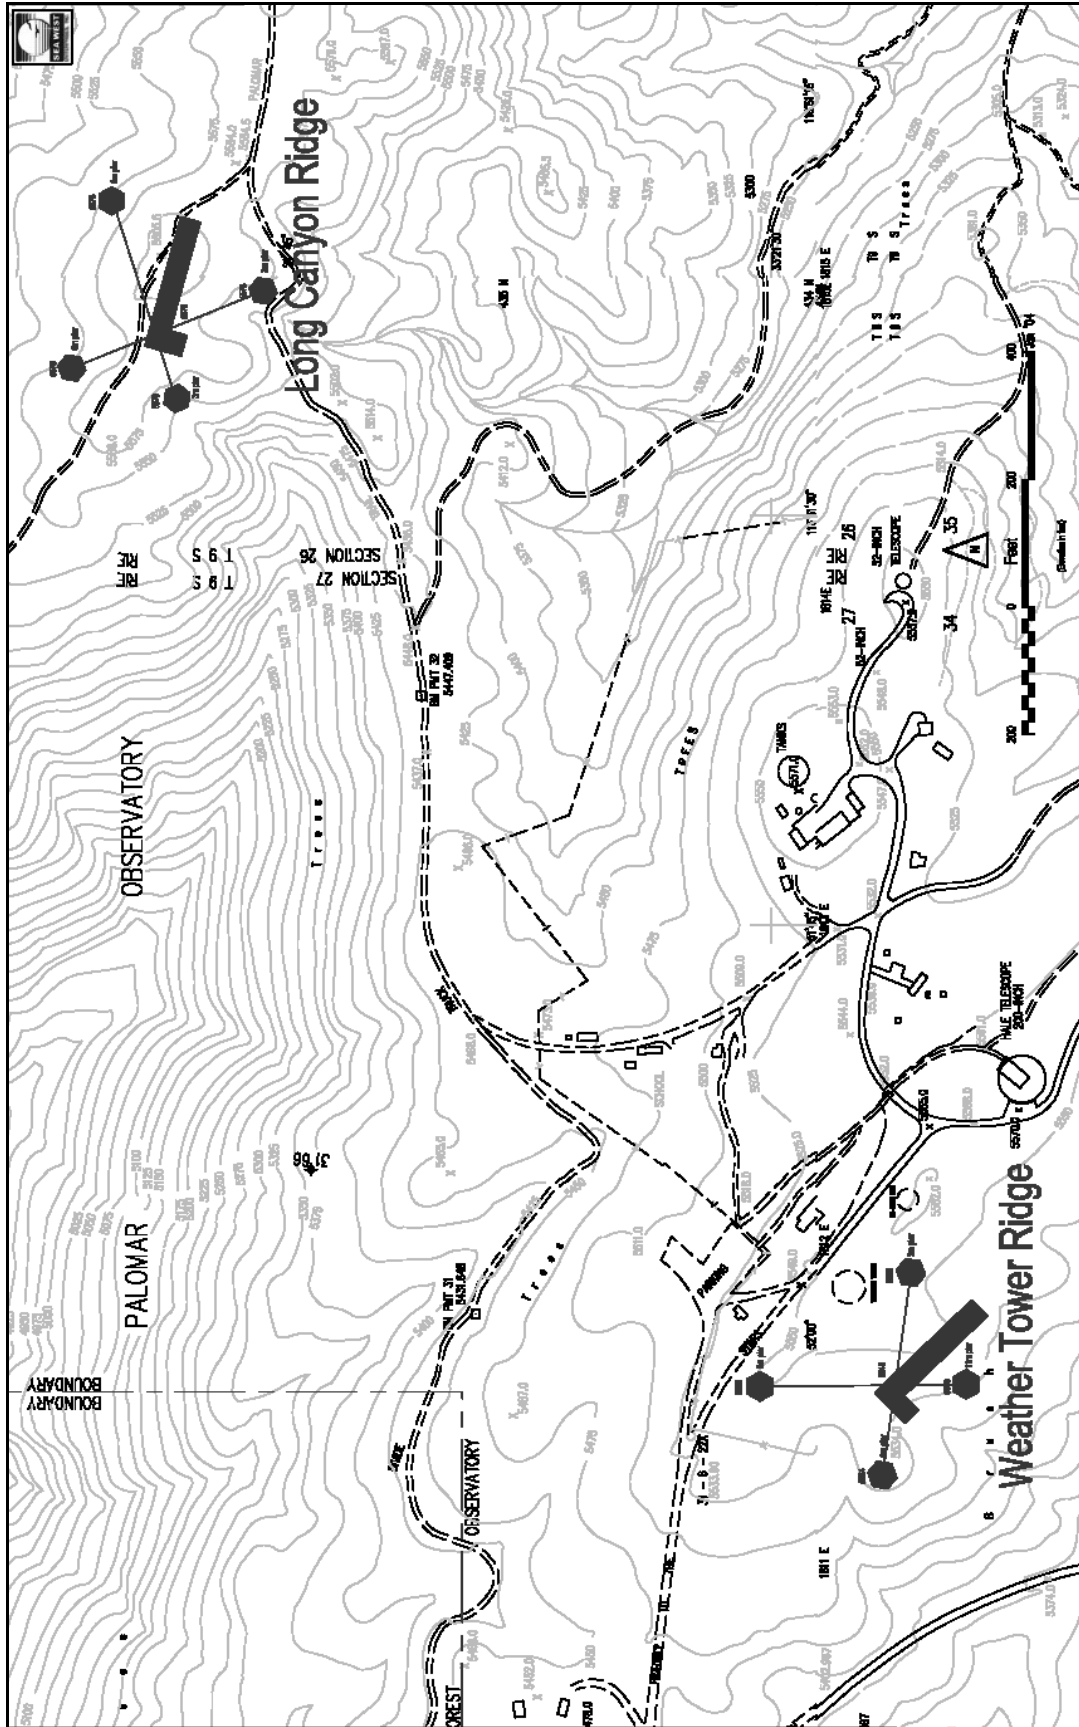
PROPOSED SITE LAYOUT OF THE OUTRIGGER TELESCOPES ON PALOMAR MOUNTAIN
